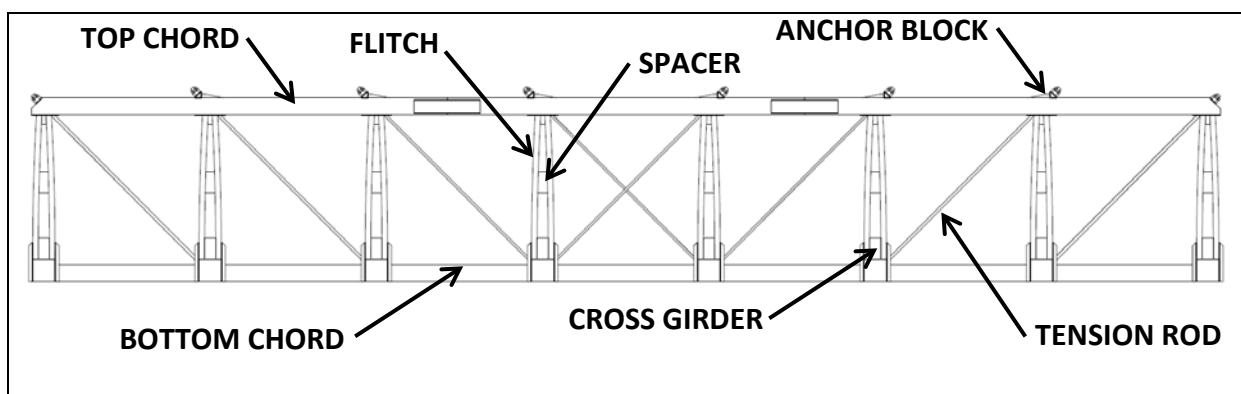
Diagram showing de Burgh truss terminology (source: author)
